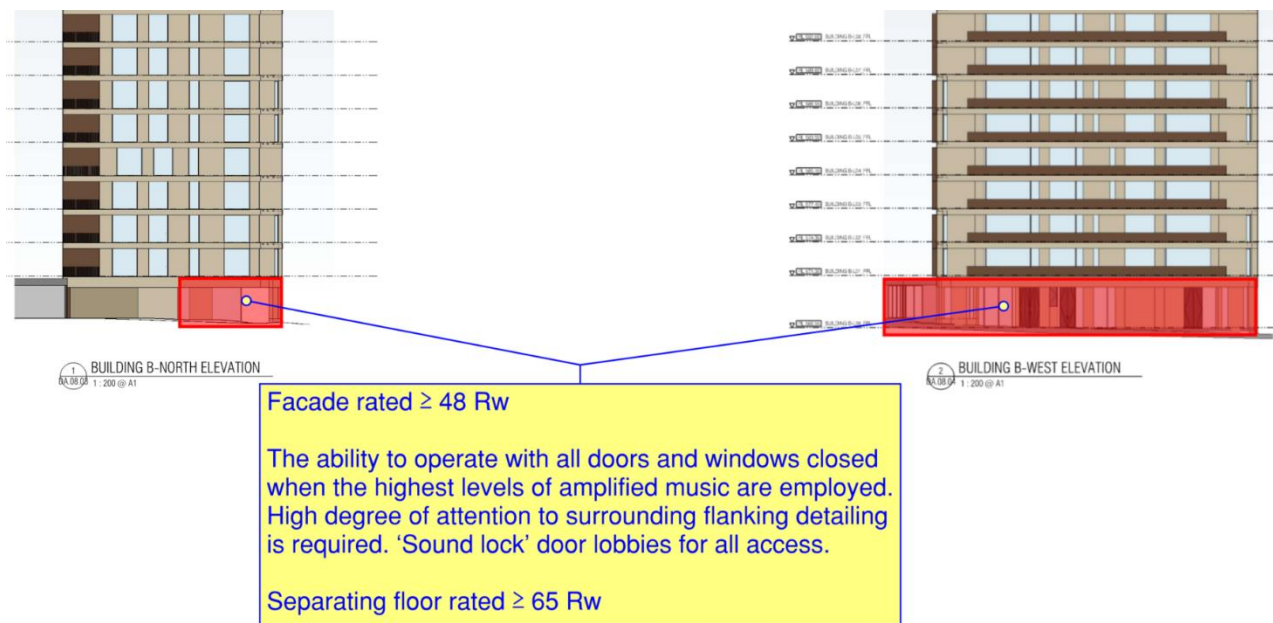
Building B façade construction requirements to mitigate amplified music (85 dBA L_{10(5-15min)}) – north and west façade
